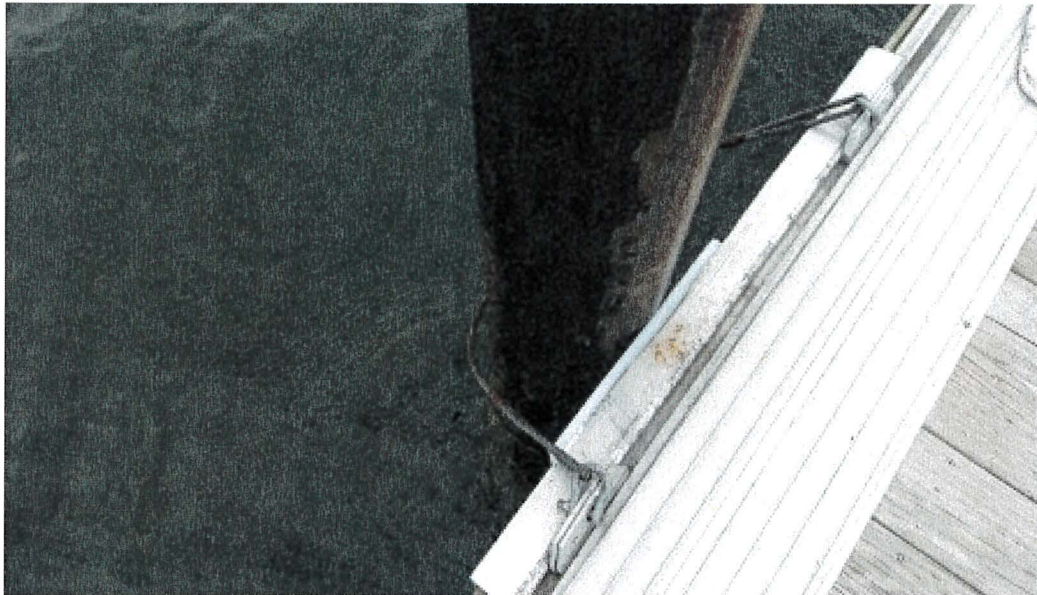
West Main – Dock E. Pile 7. Steel Wire (Minor Superficial Corrosion) instead of Pile Guide
